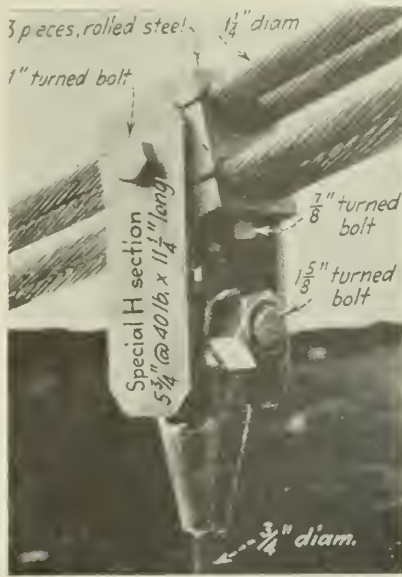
Main Cable with Cable-Band and Suspender Strand Connection—Ozark Mountain Bridge.
